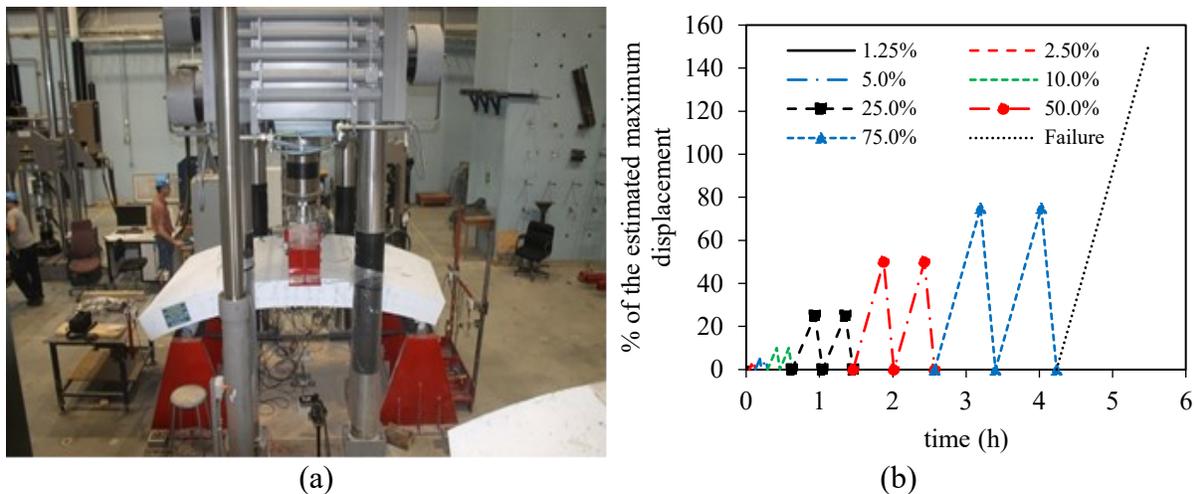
(a) Test setup (b) loading scheme for the tested specimens.
